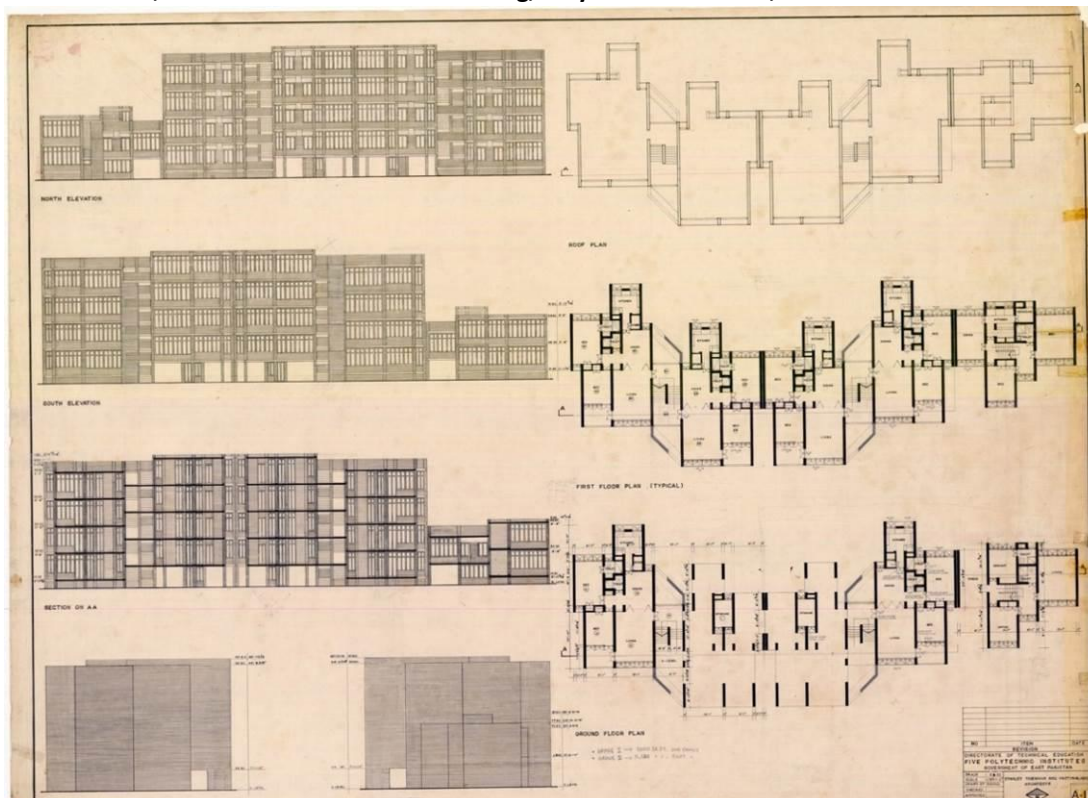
Floor Plans, Elevations and Sections. Housing, Polytechnic Institute, 1966.
